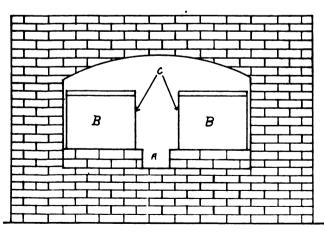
SECTIONAL VIEW OF A FAULTY FURNACE
